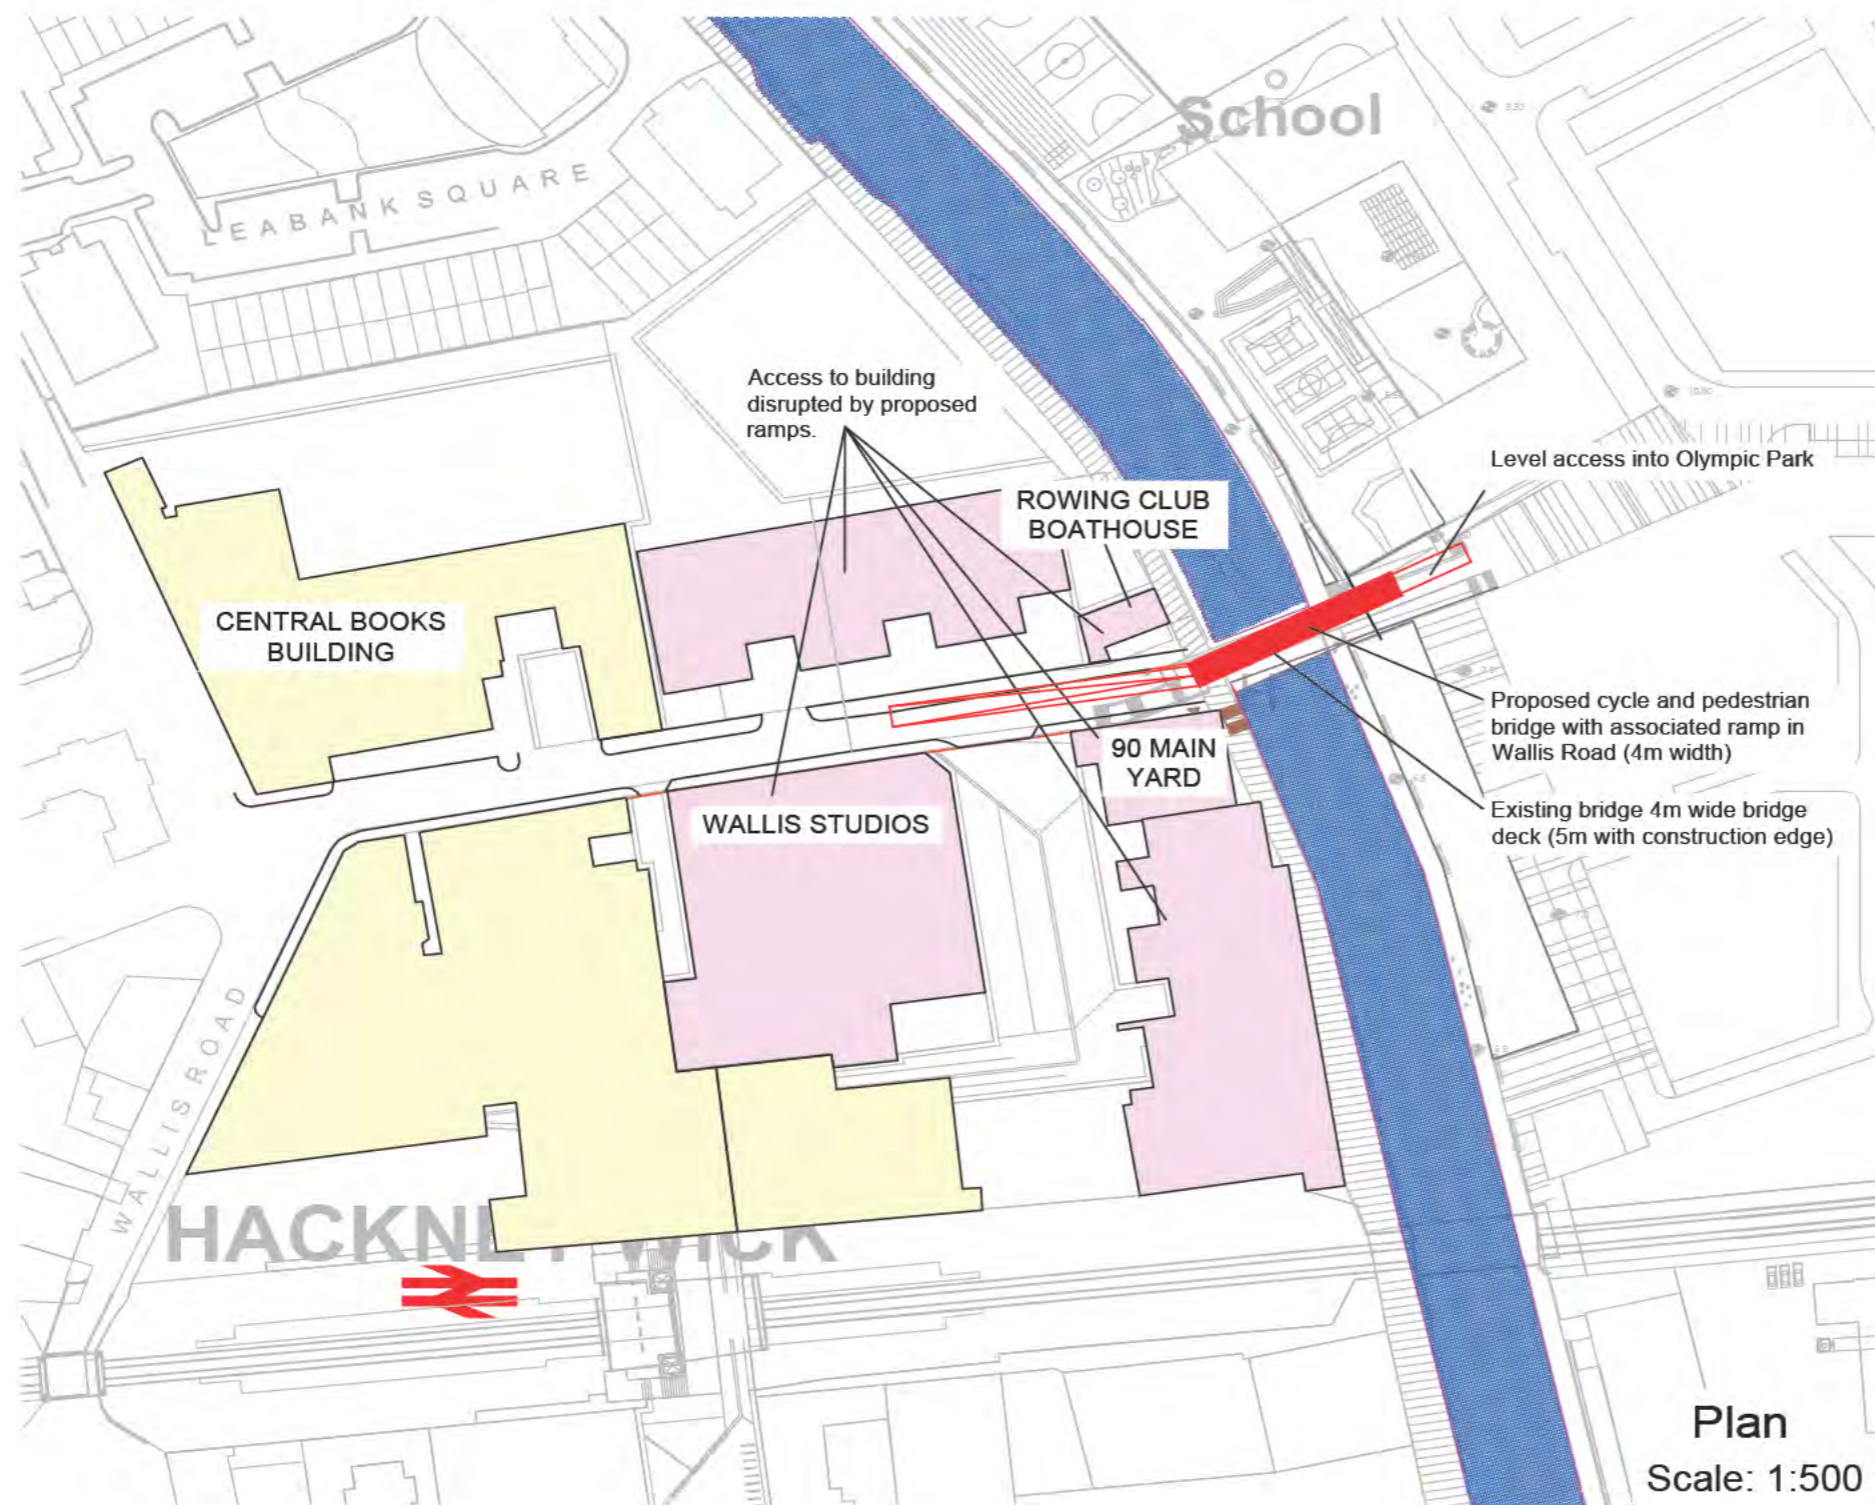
Wallis Road ped/cycle bridge Option E
